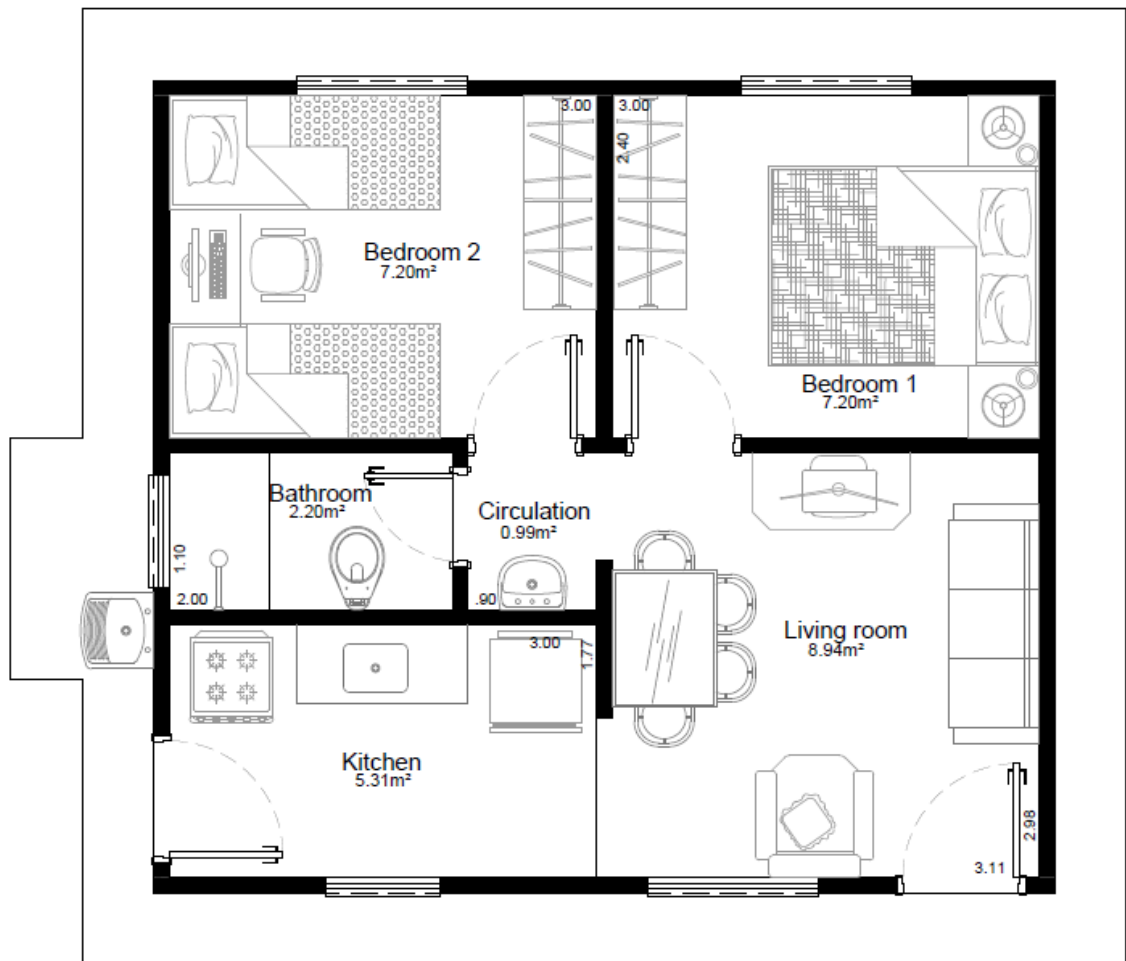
Floor plan of a house of Vila Fernanda.
